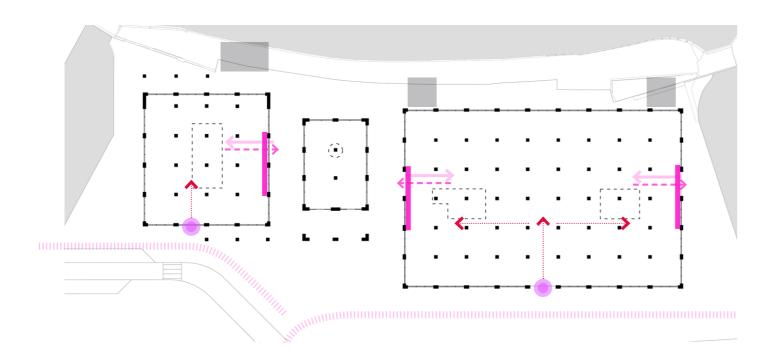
Plot 05 - Ground floor access, entrances, servicing, refuse and cycles (indicative locations)
